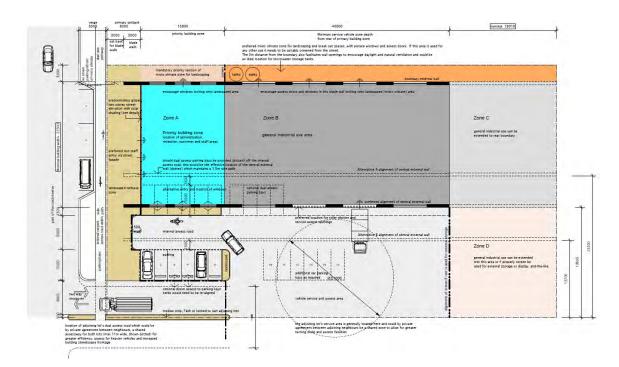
Meridian Park design guidelines – detailed site layout <sup>13</sup>
